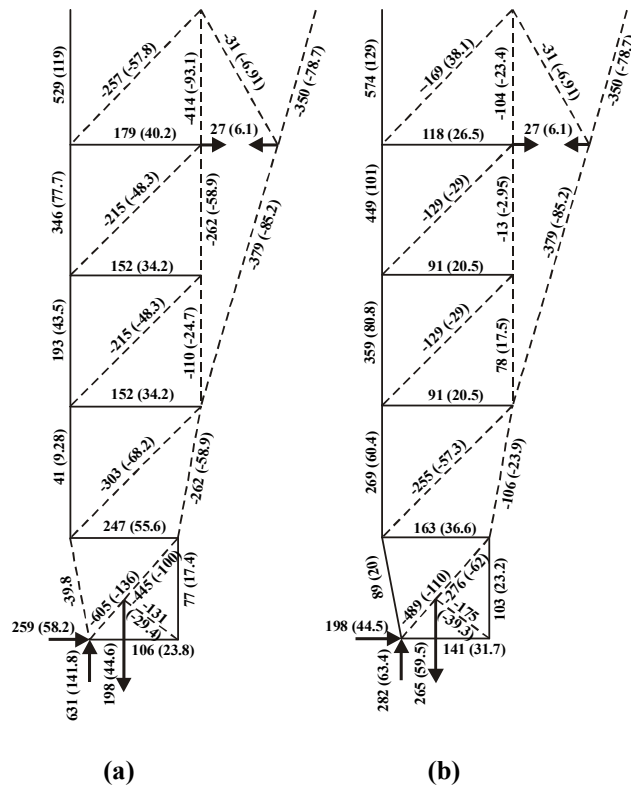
Strut-and-tie model Results for Short Columns (a) West Column Internal Forces (b) East Column
